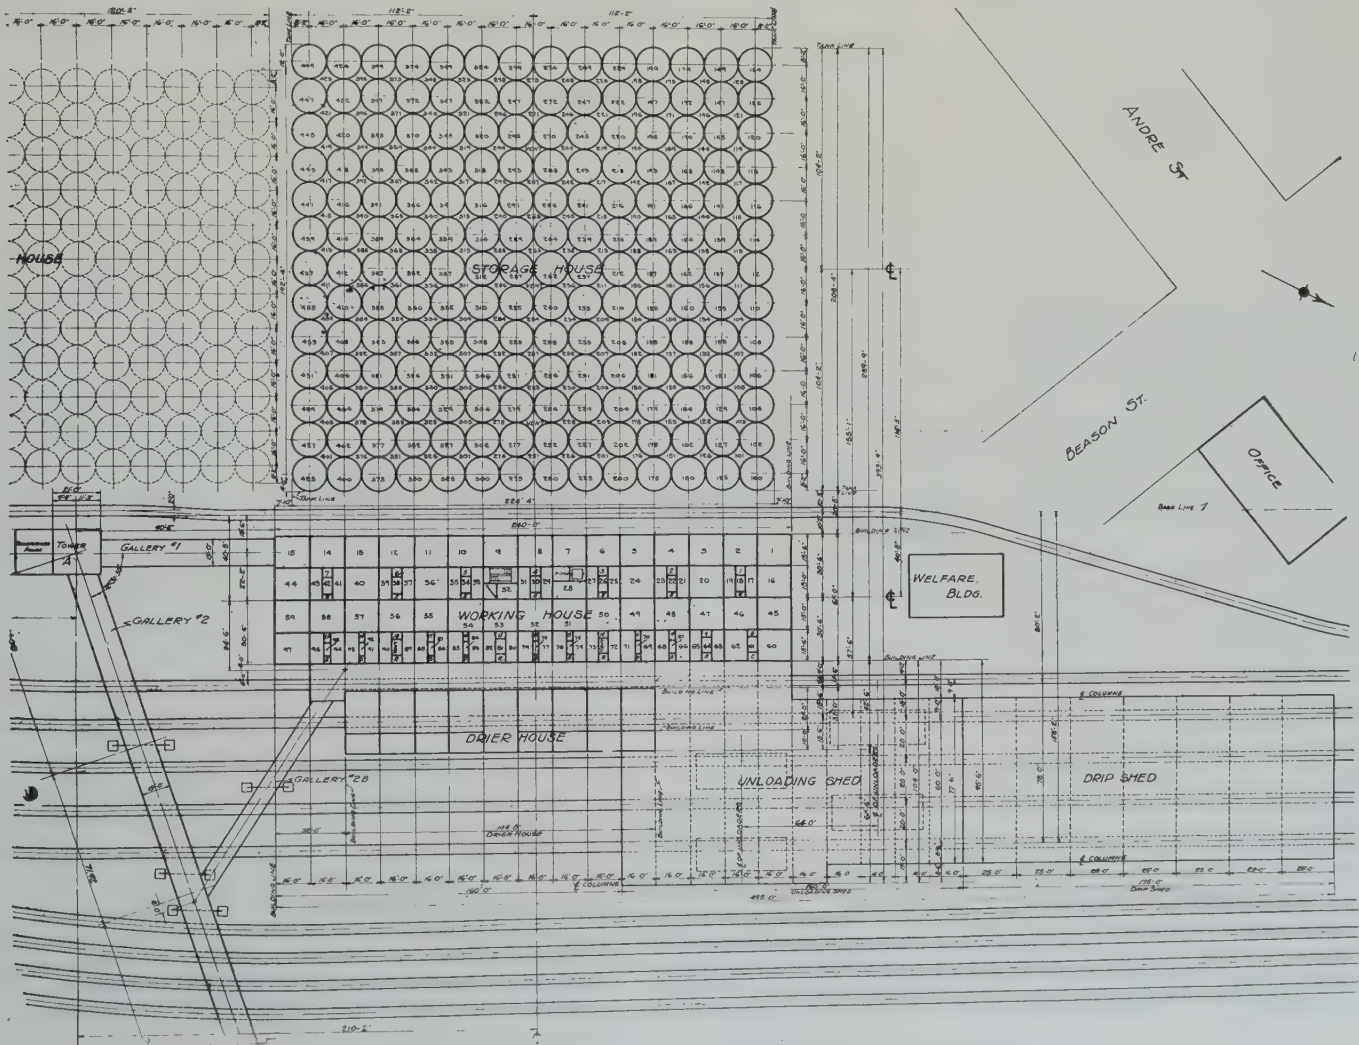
B. & O. Elevator. Showing Location of Different Units of New Elevator.
